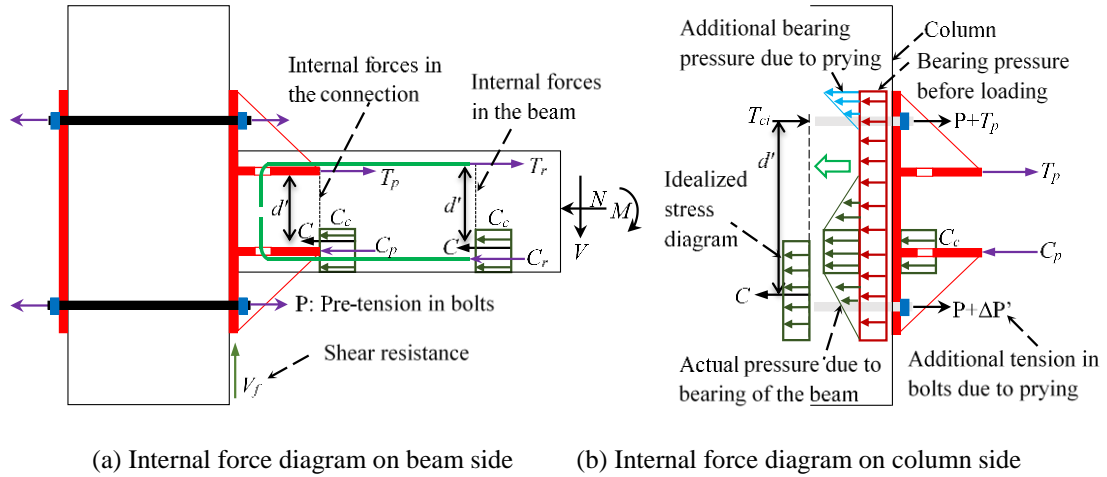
Load transfer mechanism from the beam to the column with Type-1 connection
